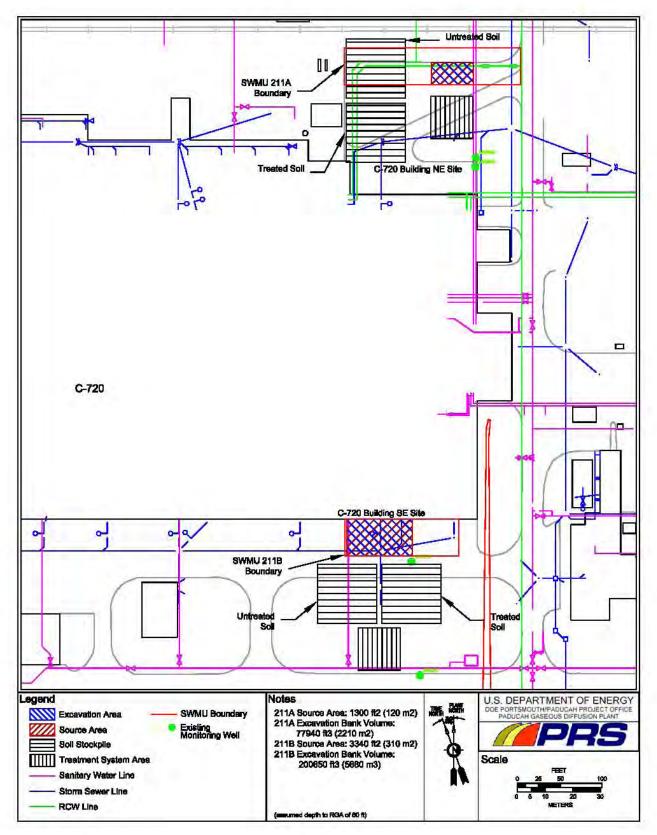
Plan View of Alternative 3 at C-720 Northeast and Southeast Sites
